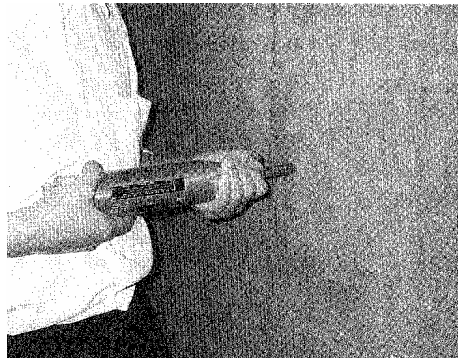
Scanning Reinforcing Bars and Steel Beams
